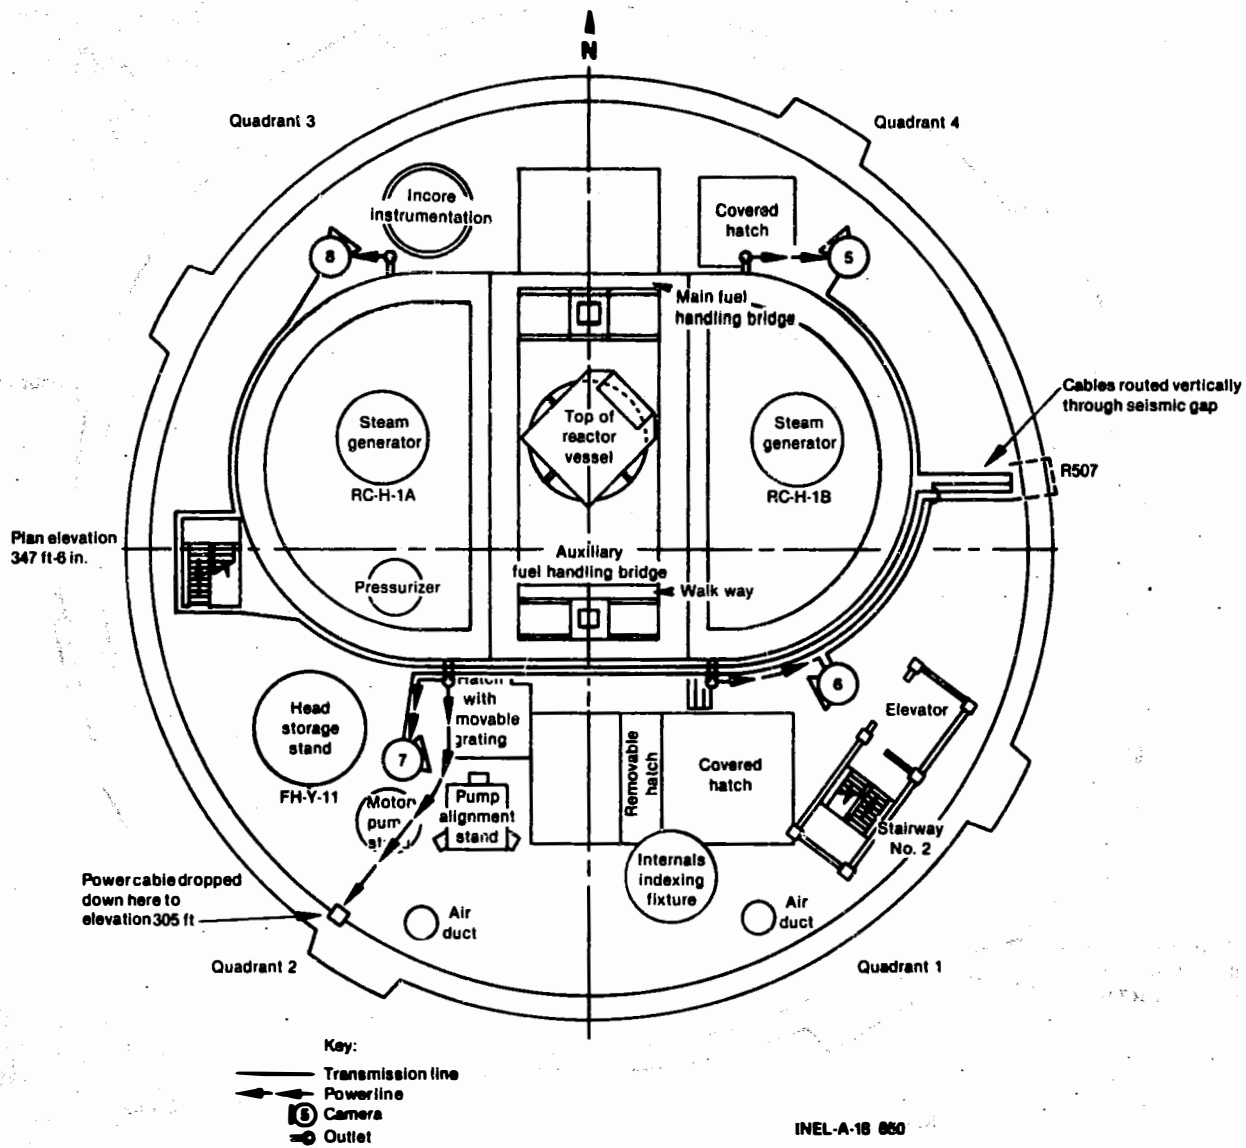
Entry 6, Elevation 347 camera cable routing diagram.
